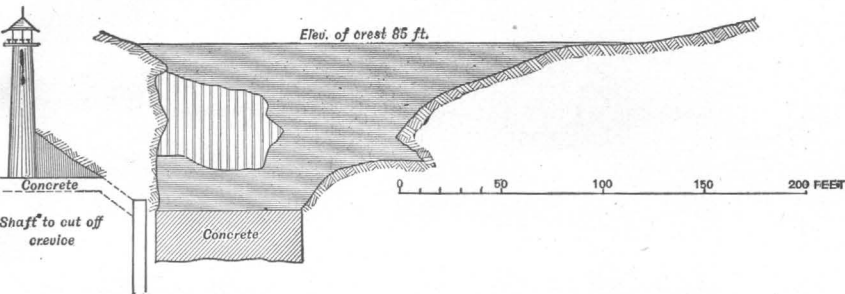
Downstream elevation, rock-filled dam, East Park dam site.
